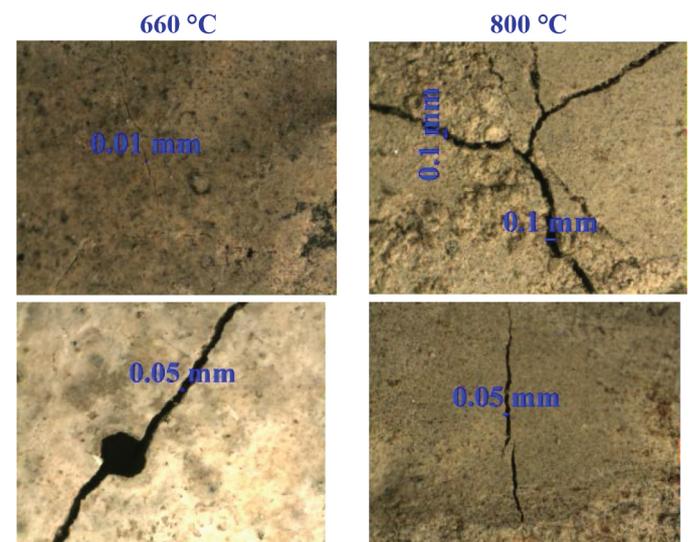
Structure of mix-design CEM II-B-M/Bas after thermal load, determination of width of cracks
